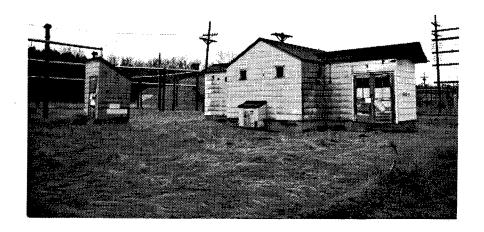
Building 6812-11: Rest and Heating House, not barricaded.
